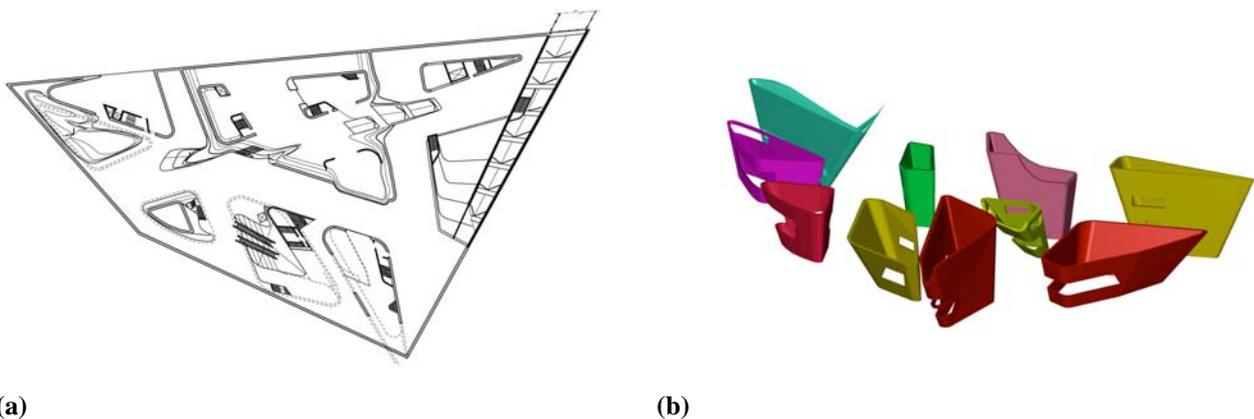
(a) plan view an cone numbering system (b) isometric view
